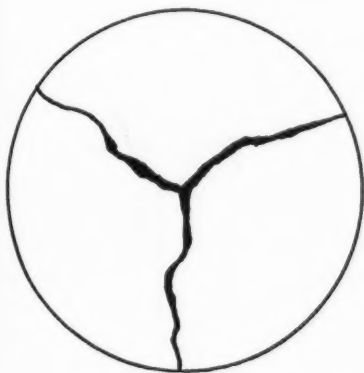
(left)—Typical three-branched crack resulting from drying shrinkage.
